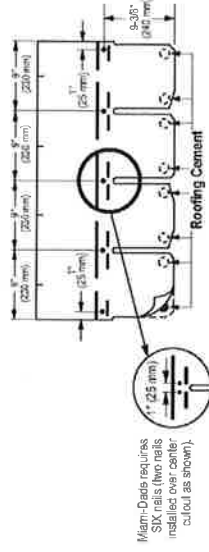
Use FIVE nails and eight spots of asphalt roofing cement under each lab corner.
